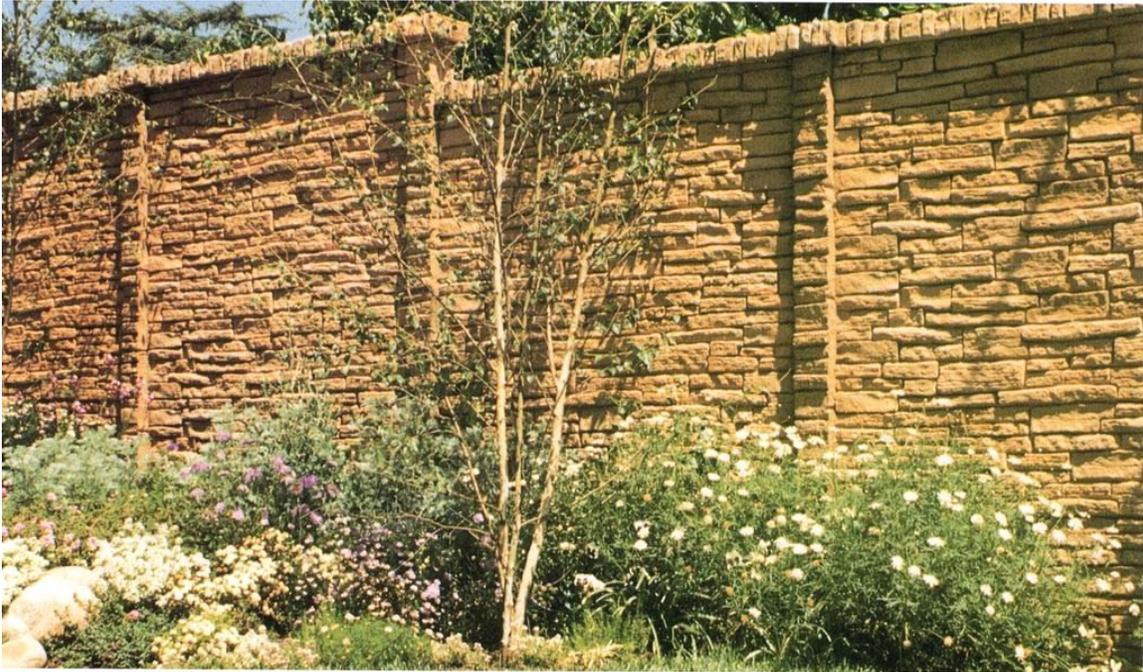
Thin Panel Concrete Wall – FENCESTONE™
